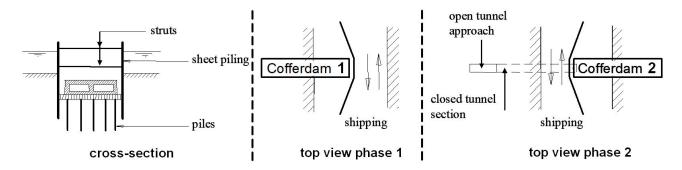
Cofferdam constructed in-situ for a tunnel
